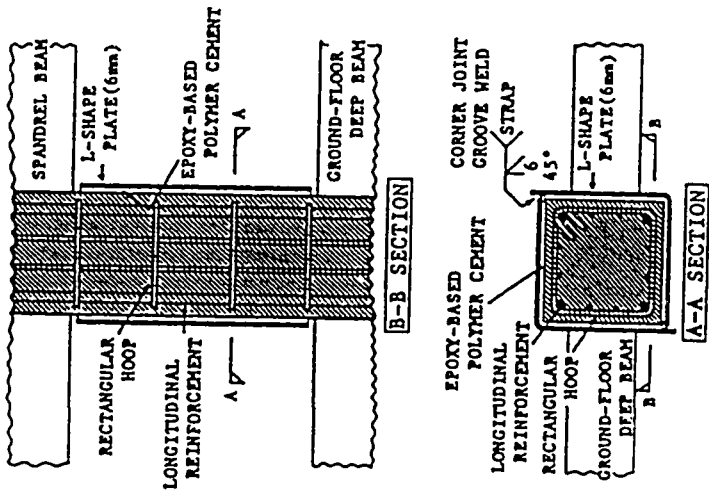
Shear Strengthening and Repair of Short Square Columns by the Use of Steel Jackets, Details of the Basic Test Specimen, Ref. [3].
